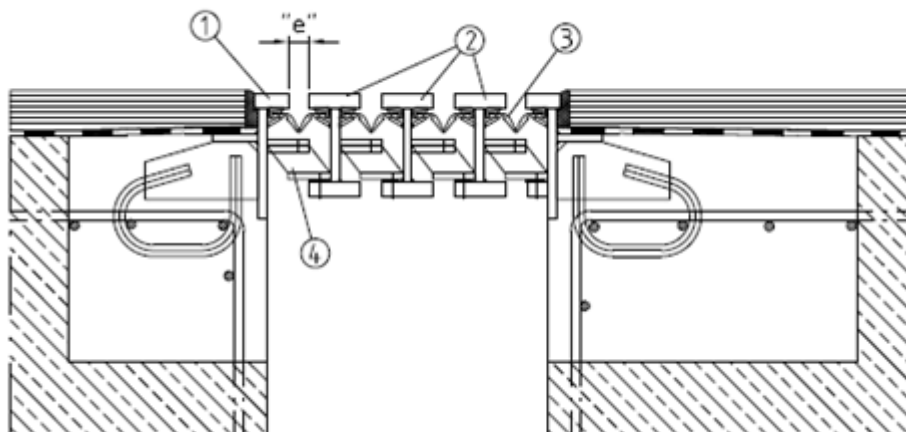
Cross section at carriageway between crossbeams of single crossbeam modular expansion joint with shear control elements between centre beams
